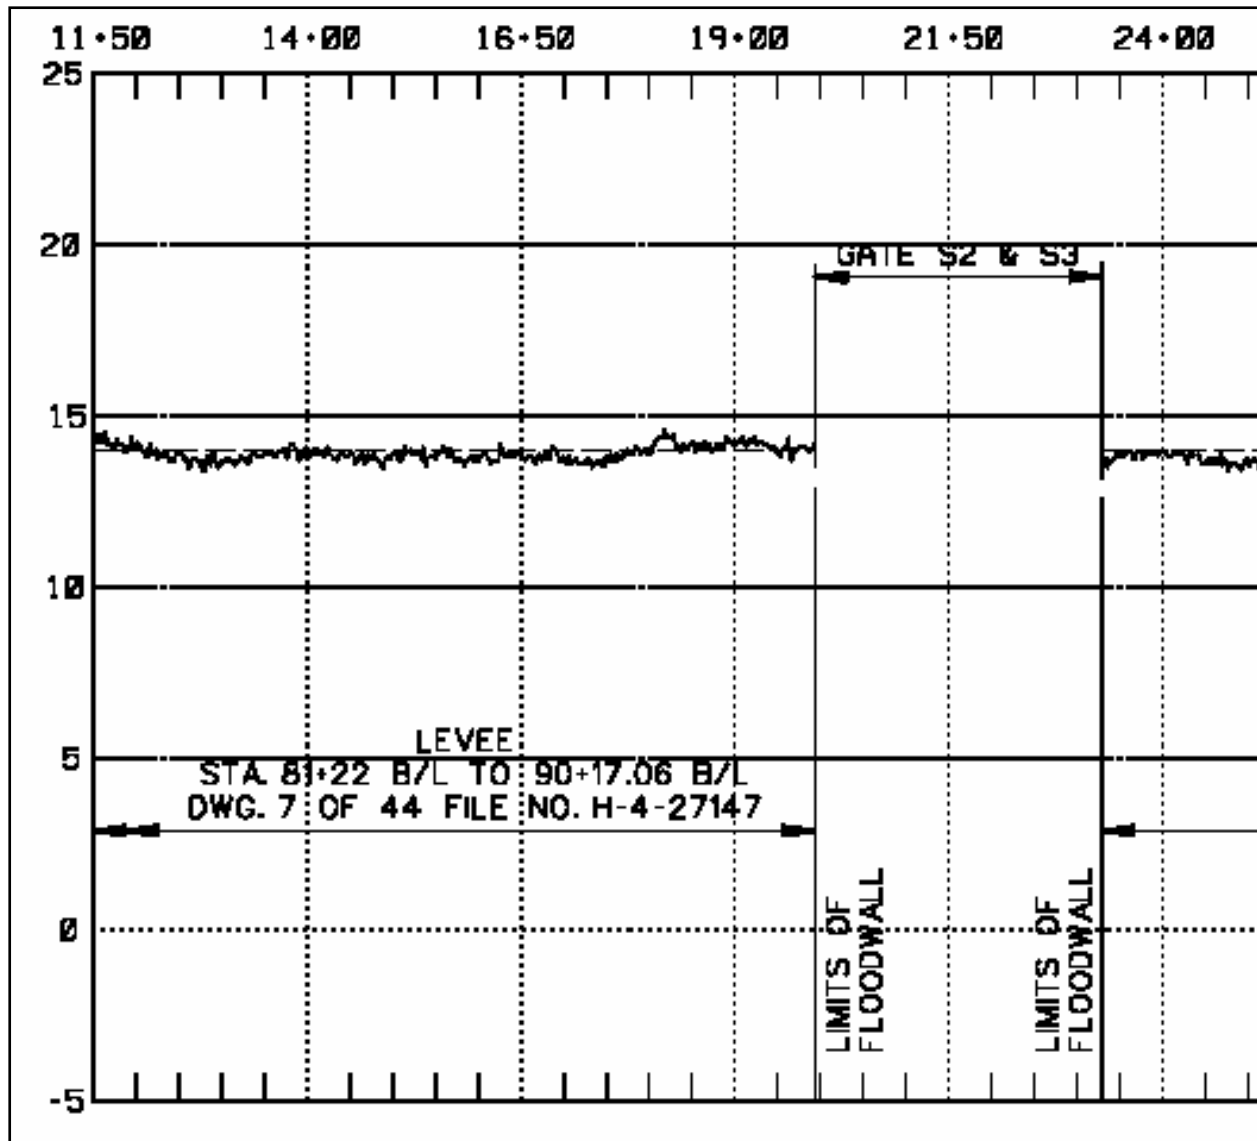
Elevations of S2, S3, and Adjacent Levee (from Chalmette Area Plan Emergency Restoration contract solicitation W912P8-06-R-0022 drawings, October 2005)
